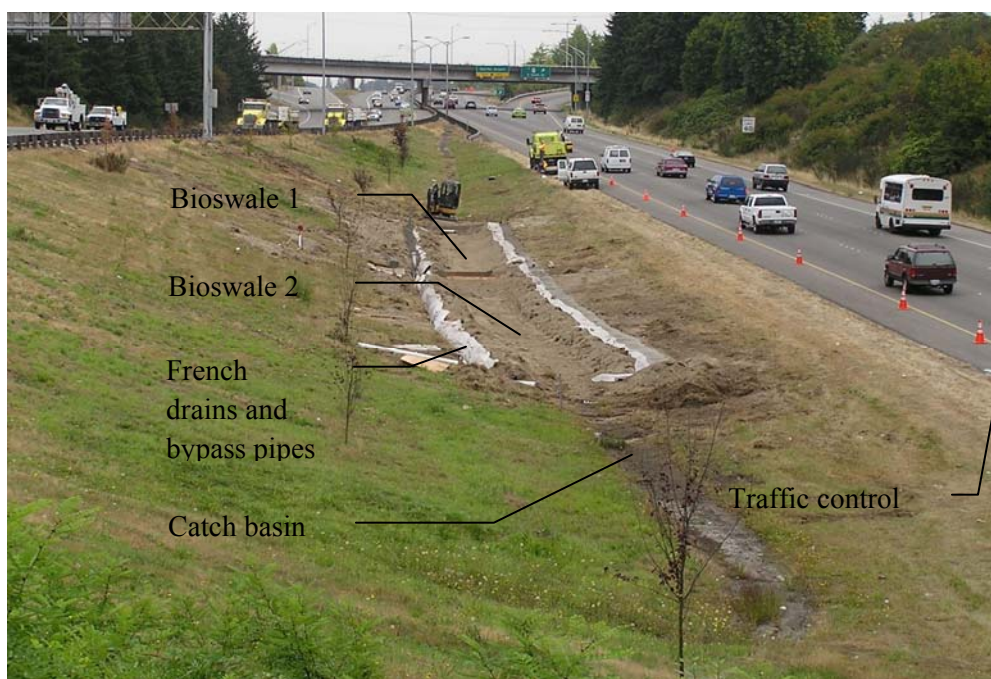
WSDOT workers installing pipe and plastic sheeting in French drain
